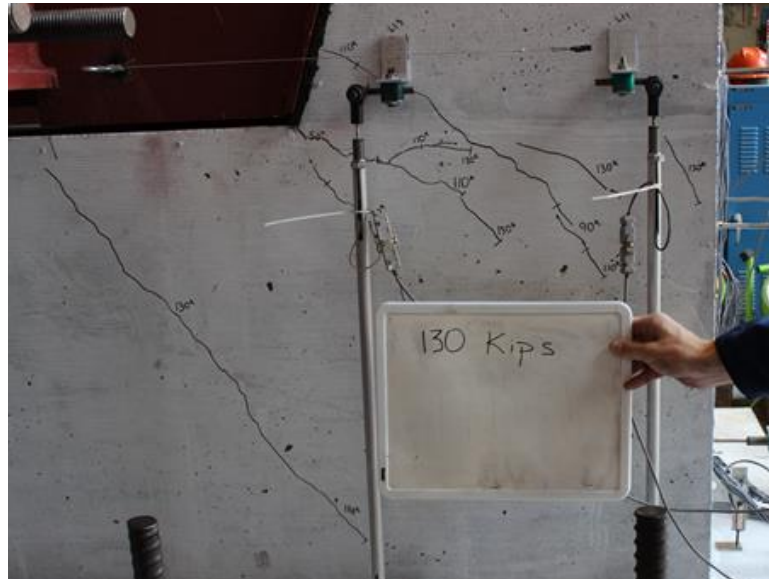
Cracks on the east face of shear key 8A at 130 kips load
